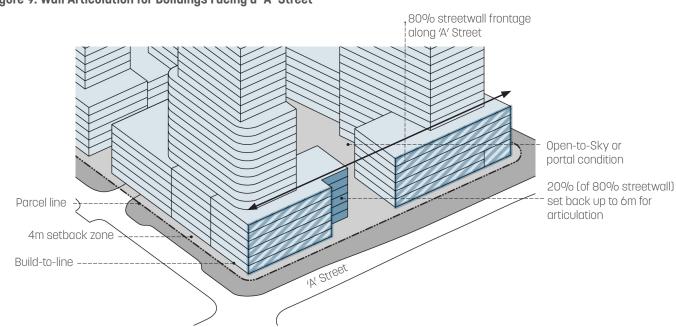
Wall Articulation for Buildings Facing a 'A' Street
